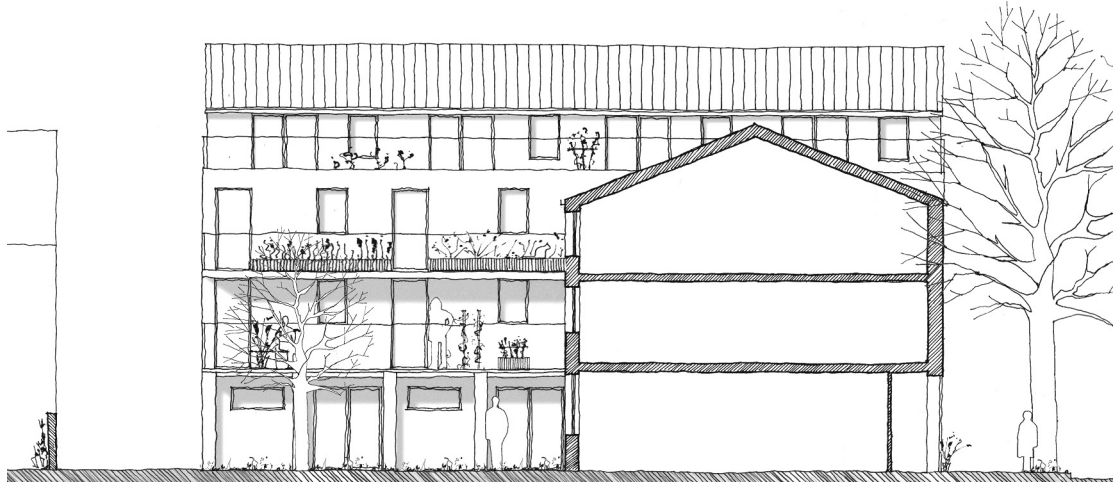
Rear elevation of duplex workplace dwellings and section through apartments 1:200
